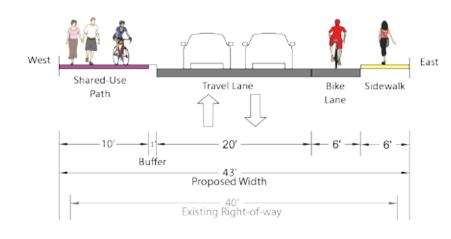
Proposed cross-section for 72nd Avenue, between Monroe Street and Thompson Road
